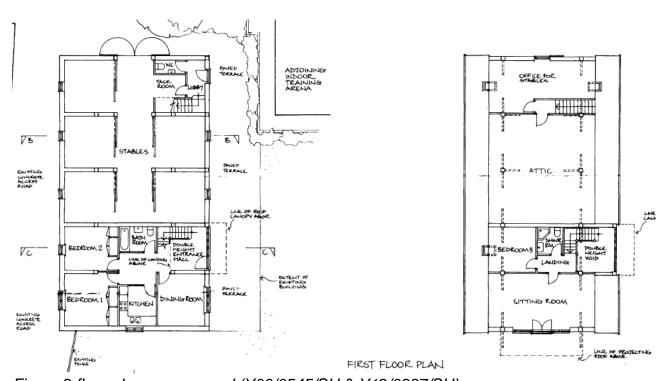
floor plan as approved (Y00/0545/SH & Y12/0337/SH)
